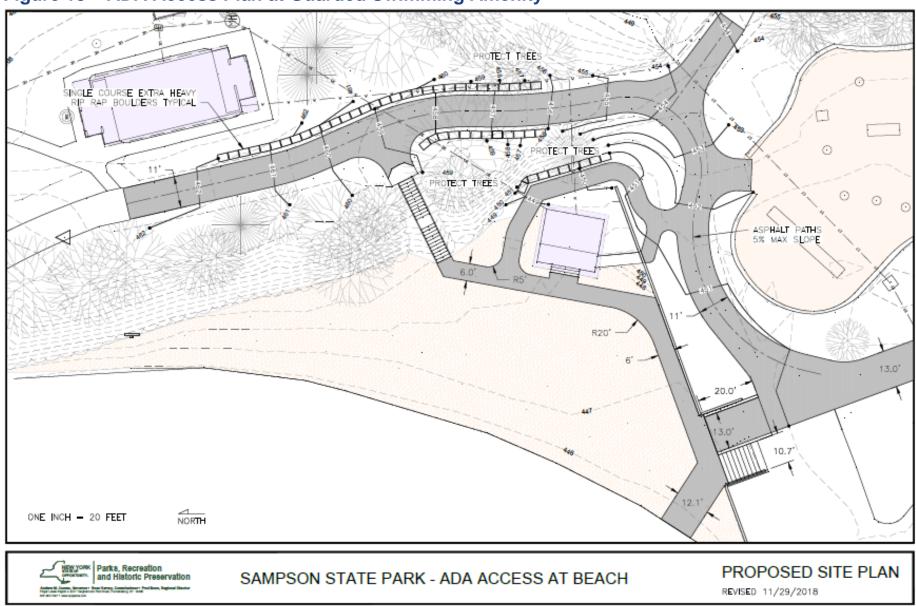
ADA Access Plan at Guarded Swimming Amenity
